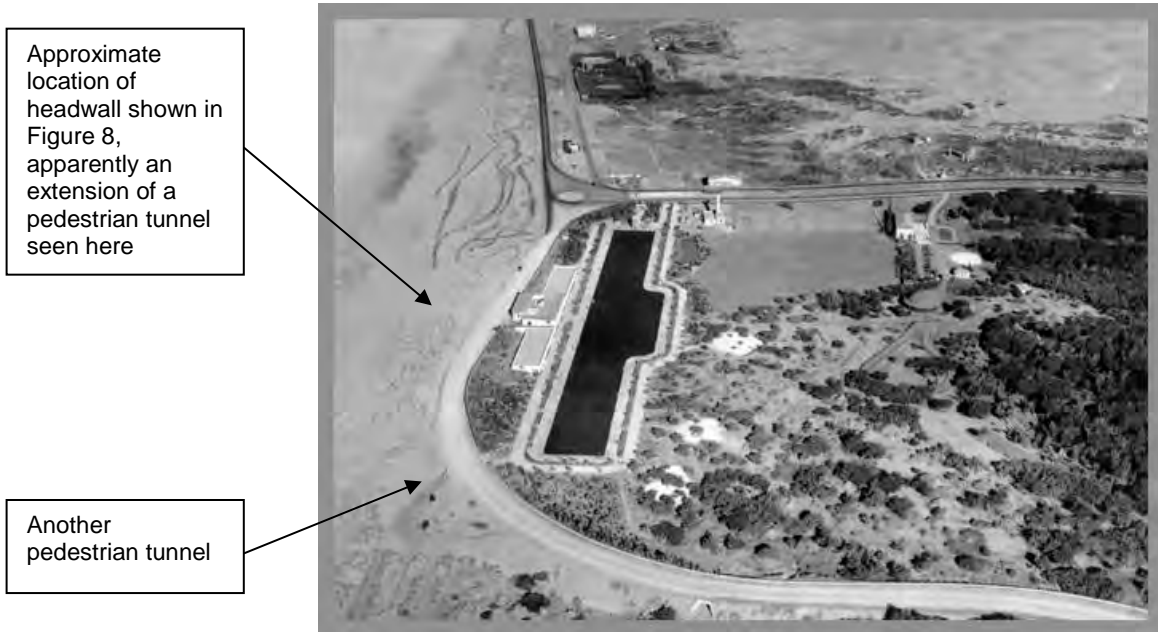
The Flieshaker Pool and building constructed in the late 1800s. Note the roadway embankment seaward of the pool, and the headwalls indicating culverts or tunnels, similar to that shown in Picture Headwall. photo date 1925 Source: James Smith, San Francisco City Guides, http://www.sfcityguides.org/public_guidelines.html?article=290&submitted=TRUE&srch_t
